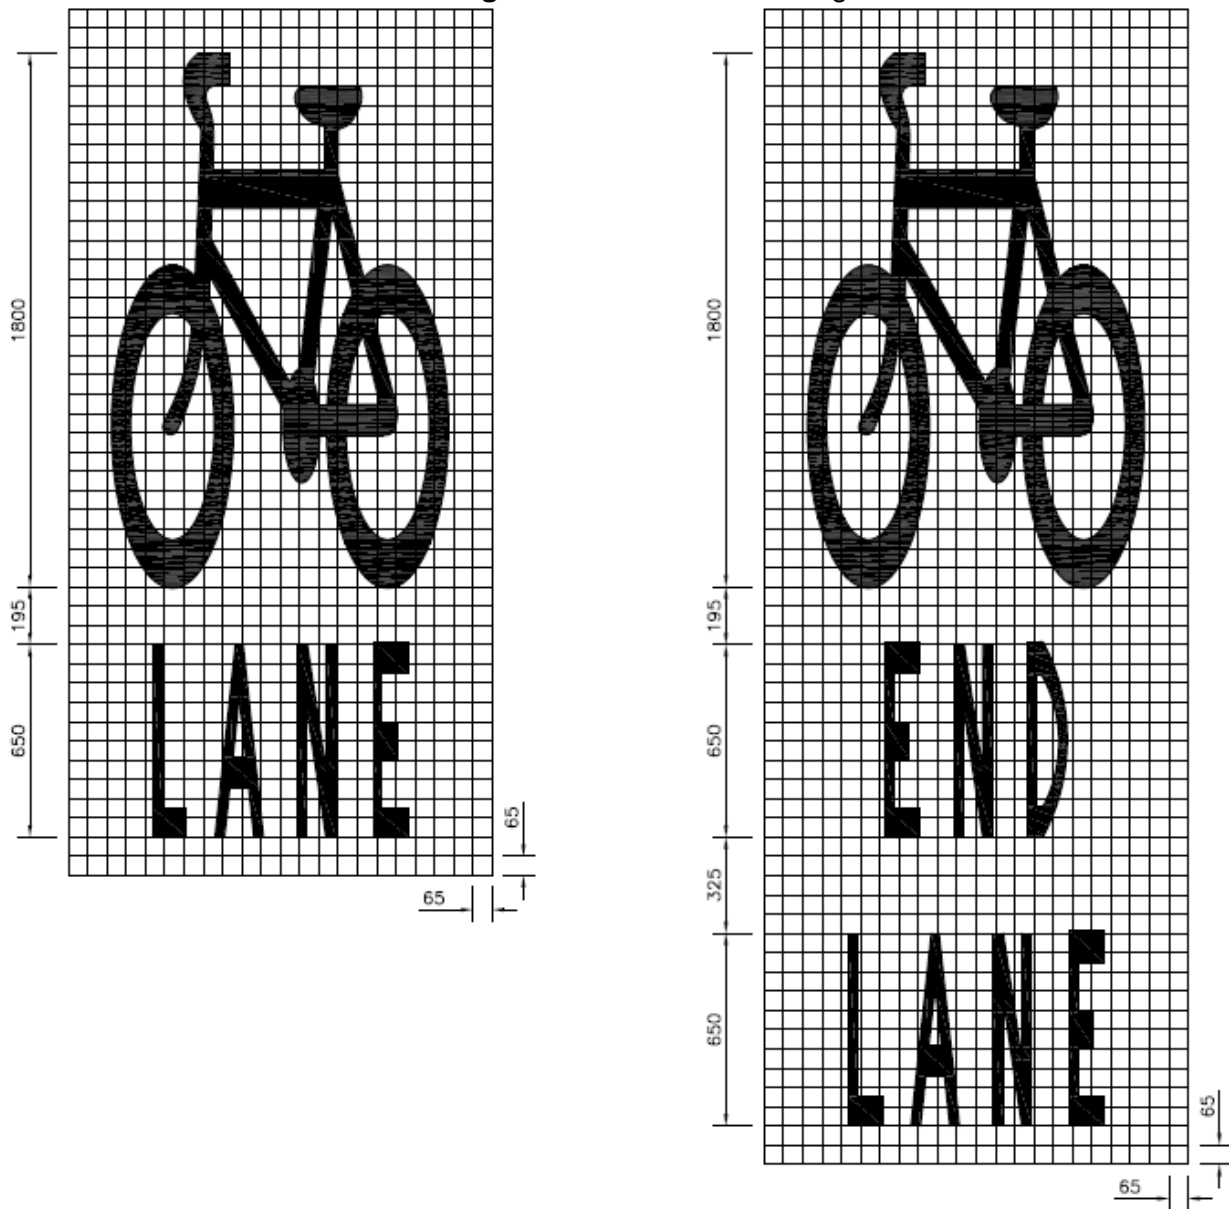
Bicycle lane pavement markings adjacent on-street parking
